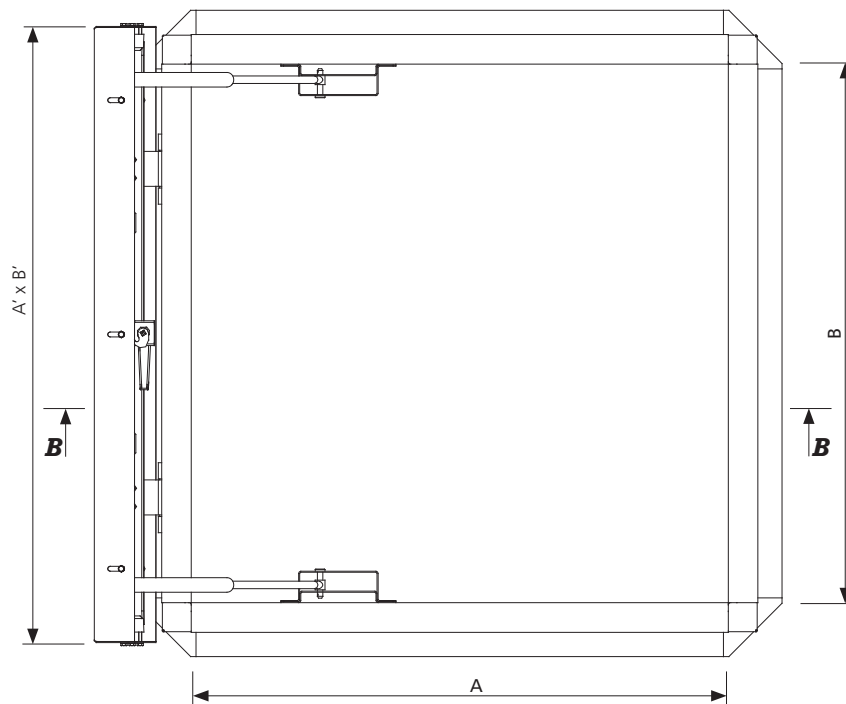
Top view of mcr PROLIGHT C roof hatch in open position, dimensions in [mm]
